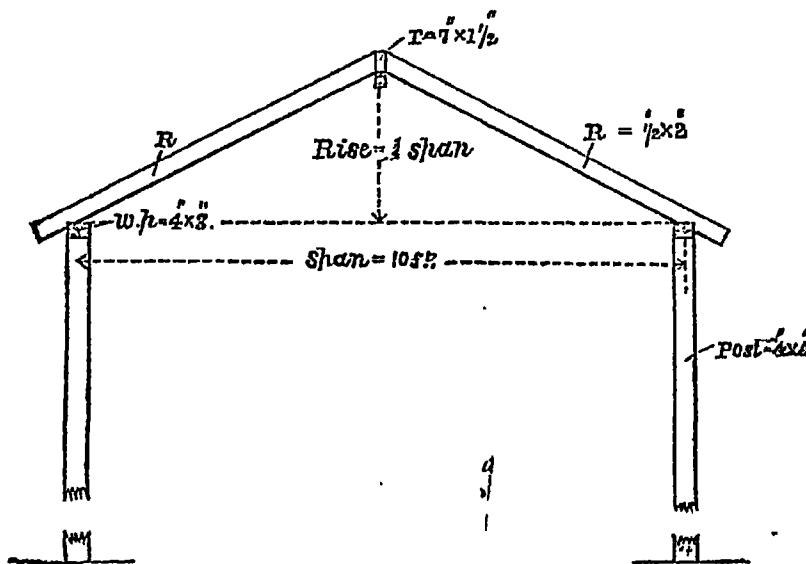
shows a simple couple roof for a wooden house. *r* is the ridge piece in section; *R*, *R* rafters in elevation; *w. p.* the wall-plate in section. The posts supporting the roof are seen in elevation. The distance between the rafters depends upon the weight of the roof to be supported. Scale = $\frac{1}{20}$.
